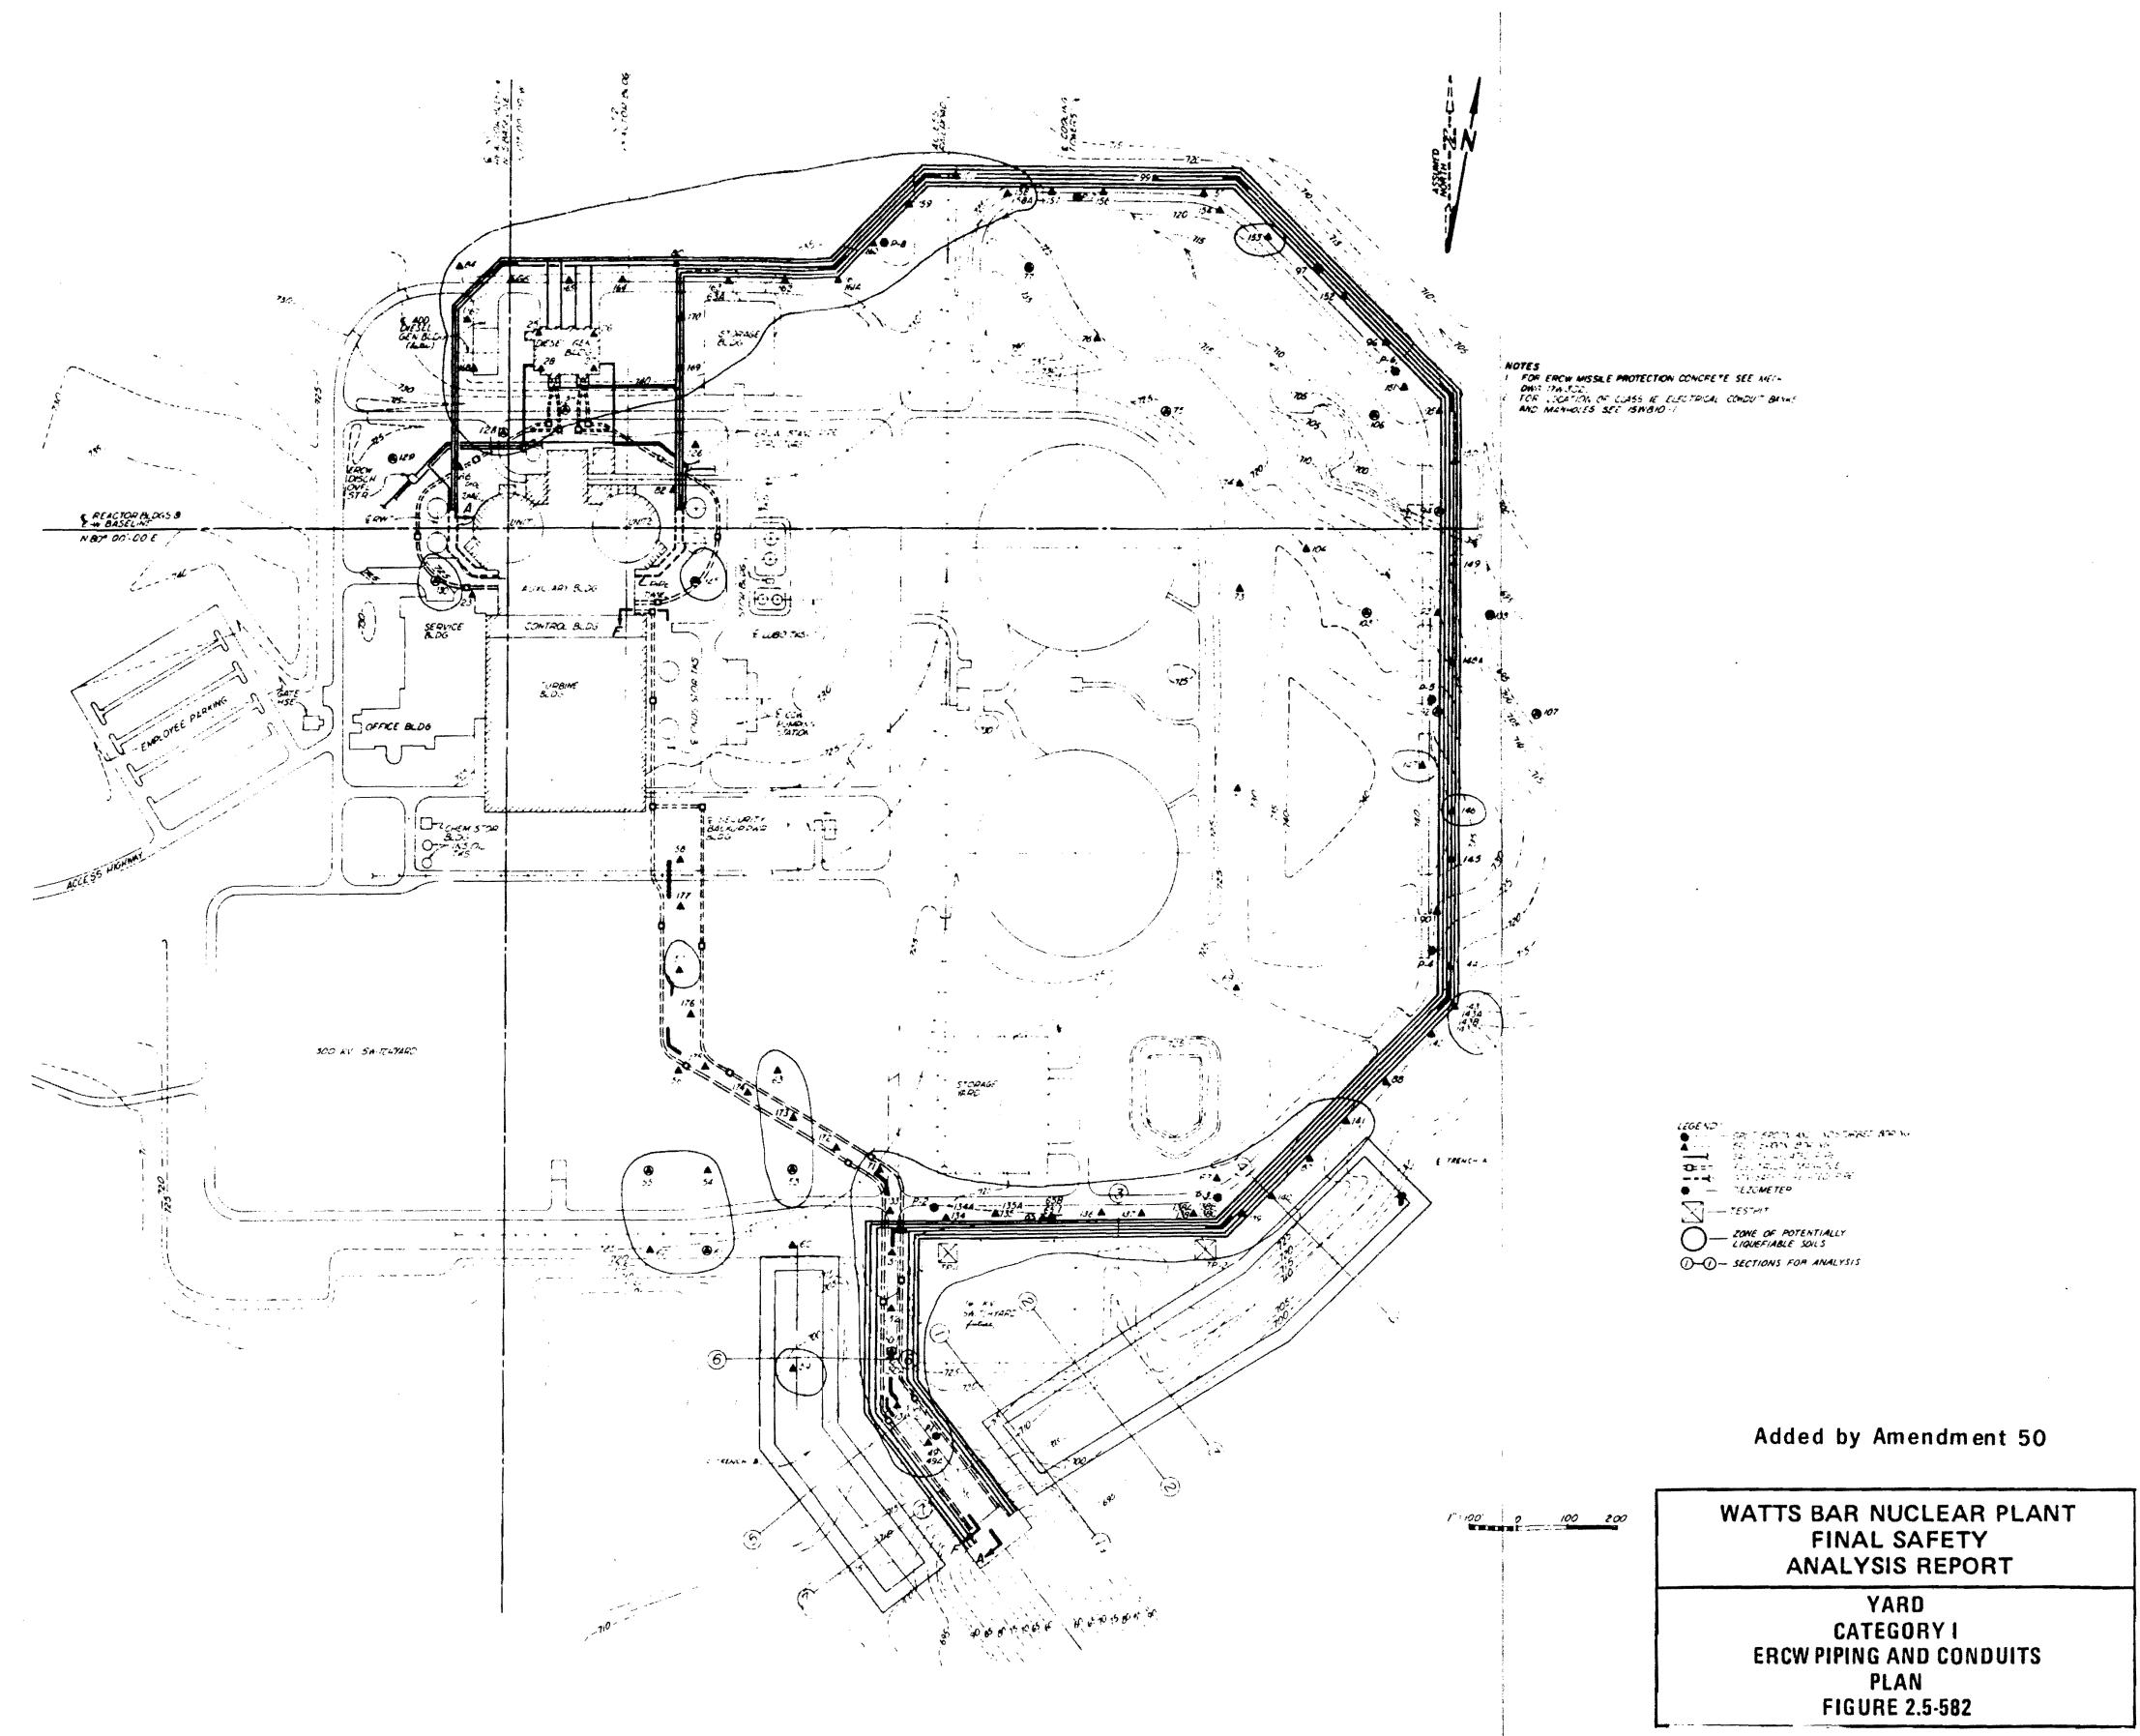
Yard Category I ERCW Piping and Conduits - Plan
